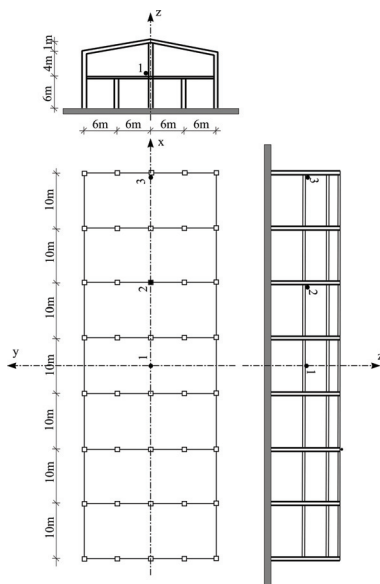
Arrangement of measuring points for a two-storey structure with panel walls
